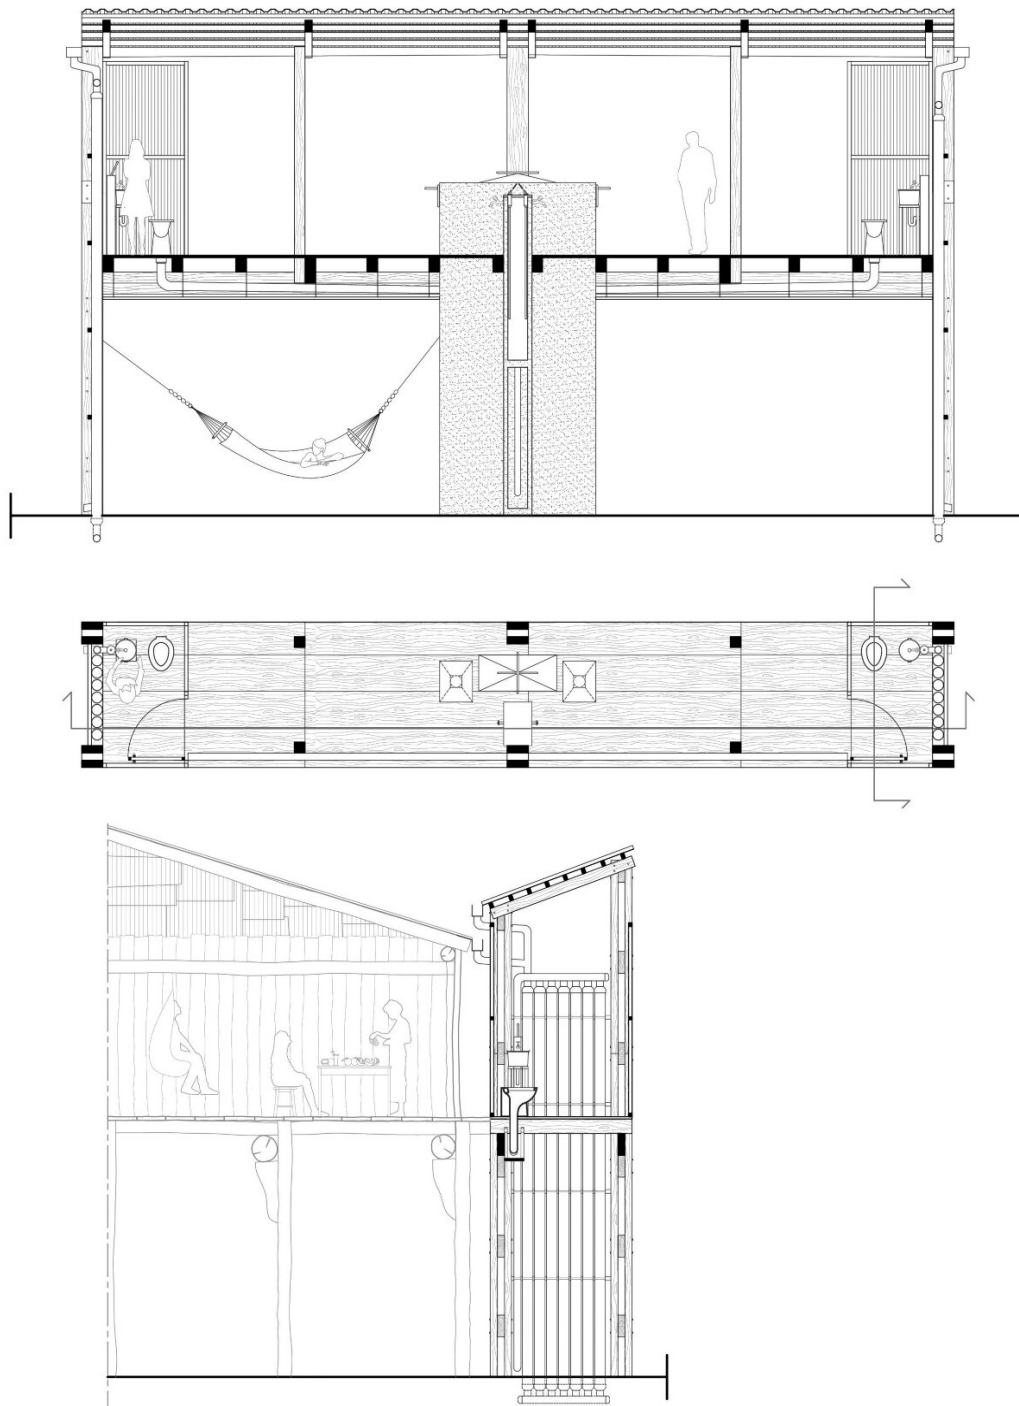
| Module for home use: longitudinal section, plan, and cross-section.
